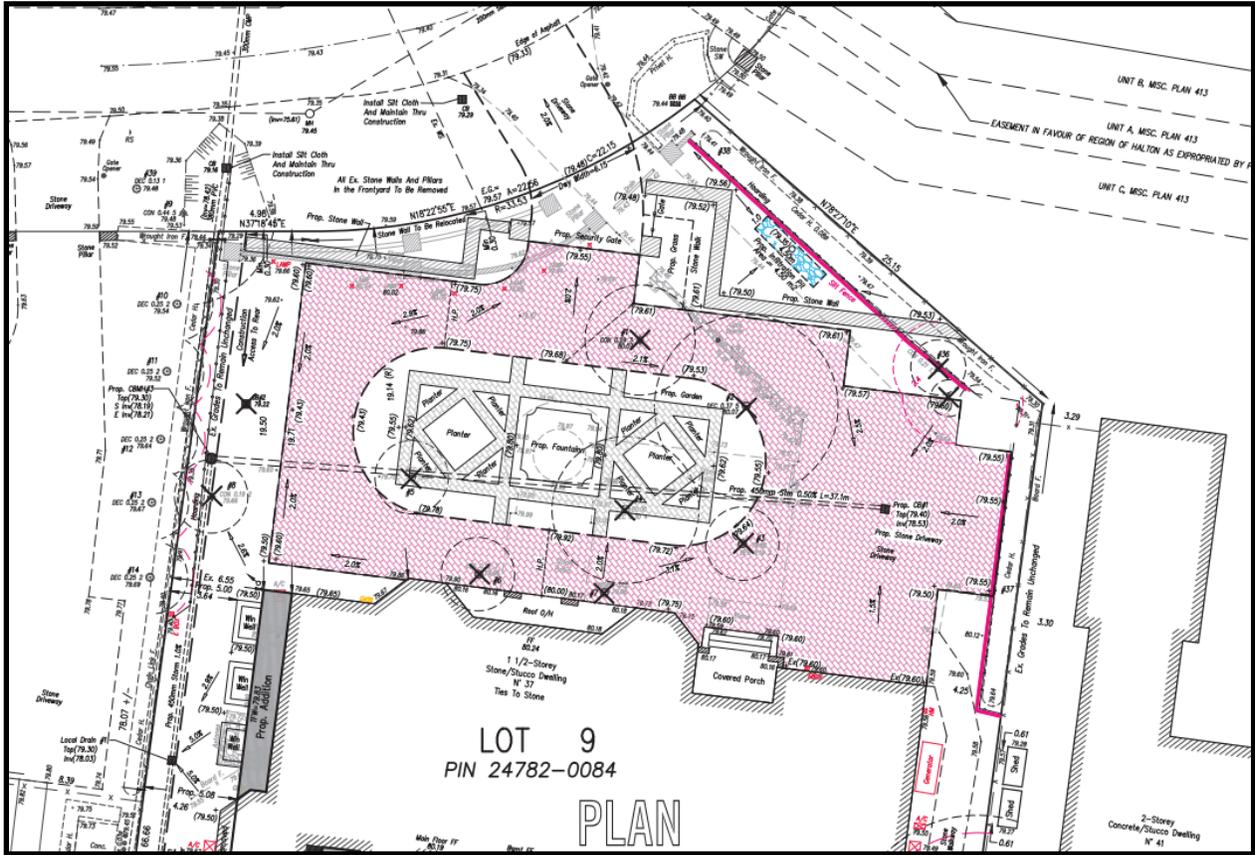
Proposed Driveway Condition – 37 Colonial Crescent
